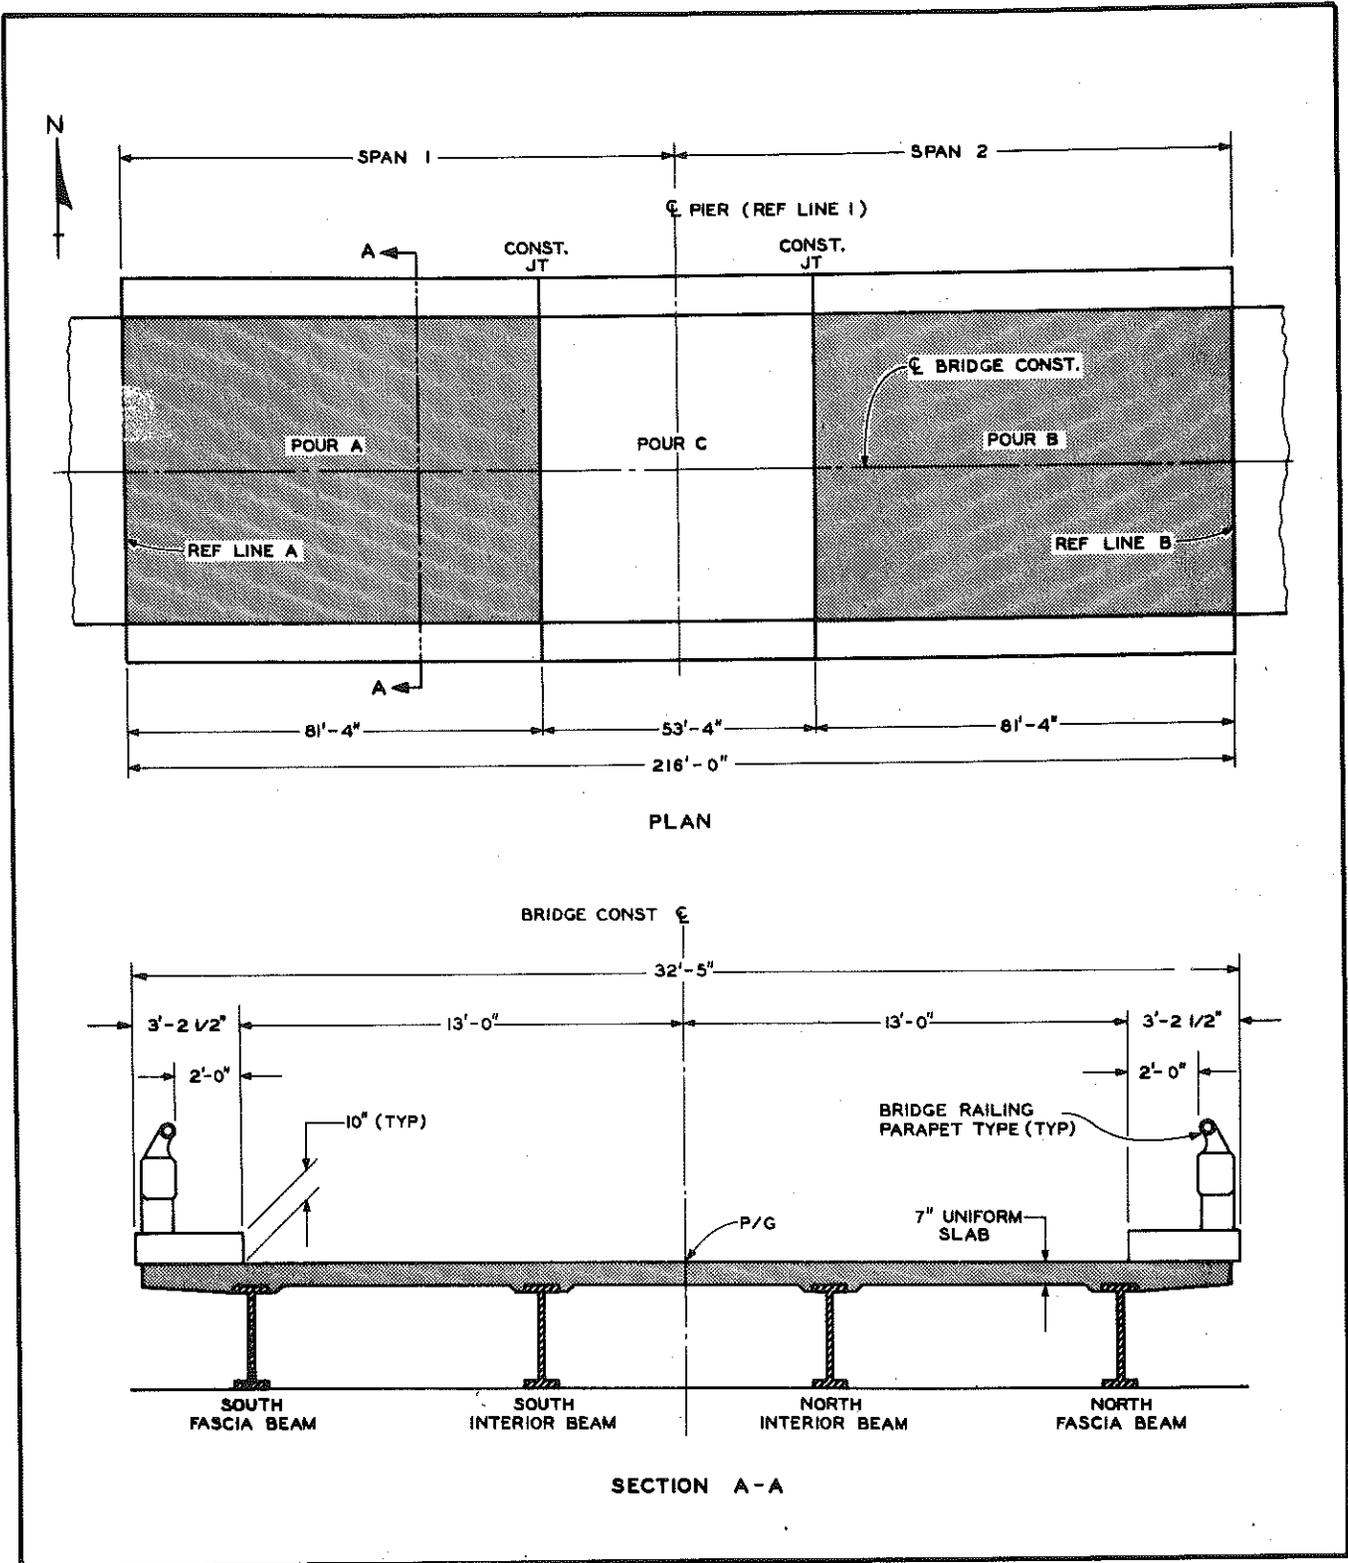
Bridge plan and cross-section, indicating concrete pour locations.
